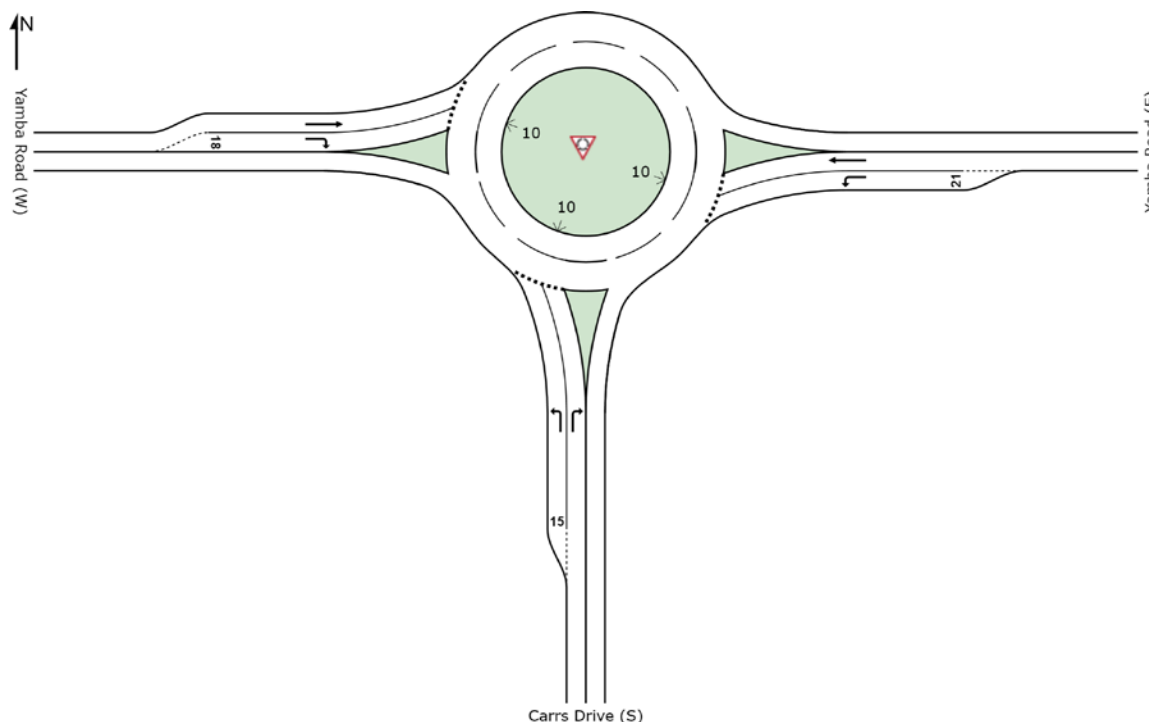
Carrs Drive / Yamba Road Intersection – Proposed Roundabout Upgrade
